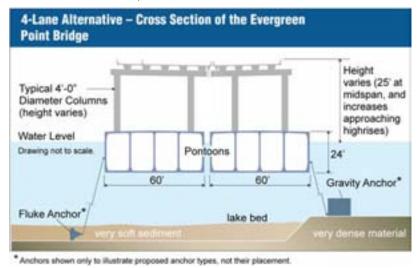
4-Lane Alternative Cross Section of Evergreen Point Bridge
